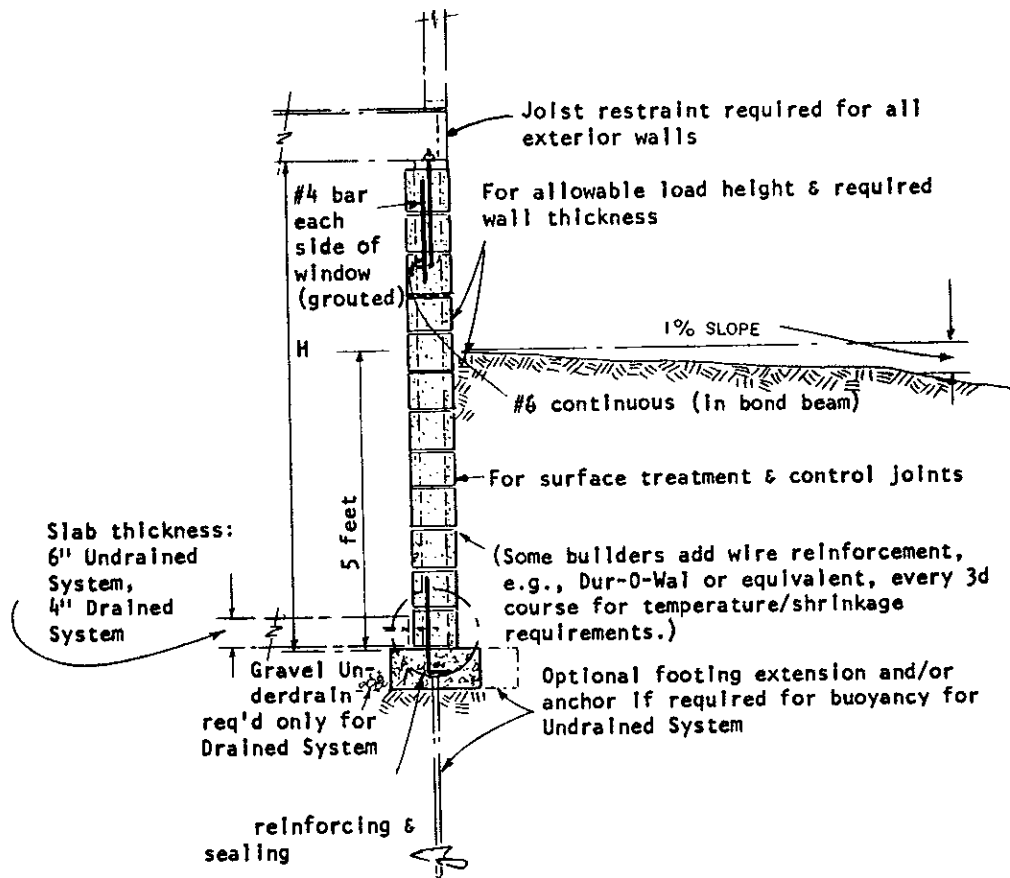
Unreinforced masonry block wall design. (Reference 26).
